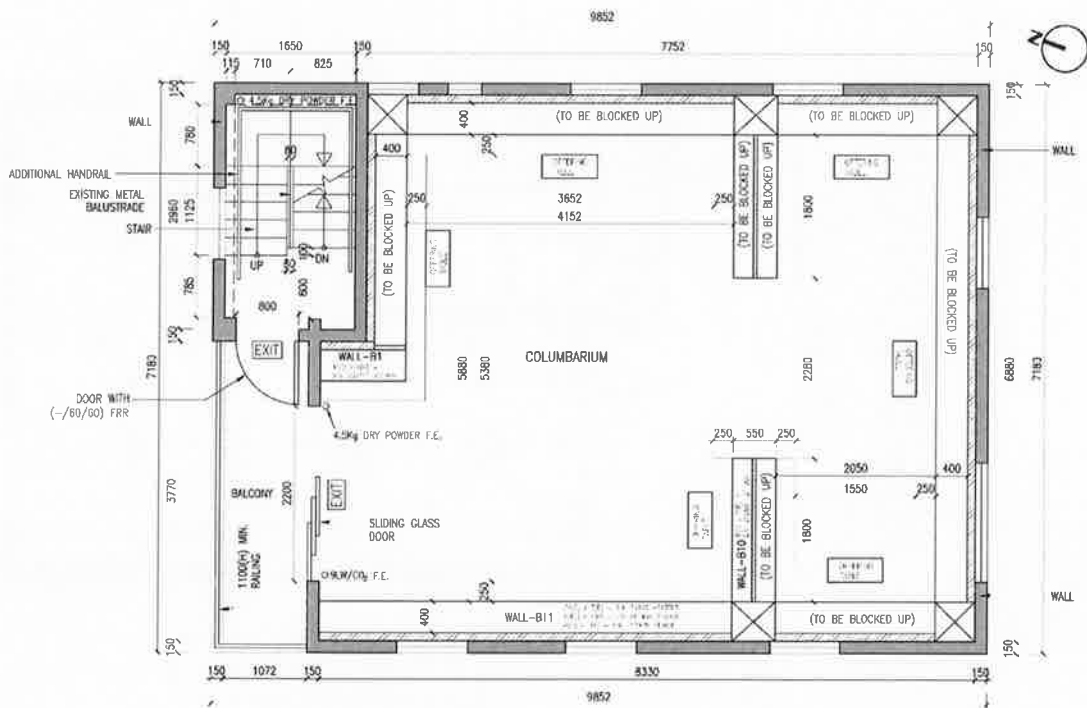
1/F (一樓) Layout Plan
